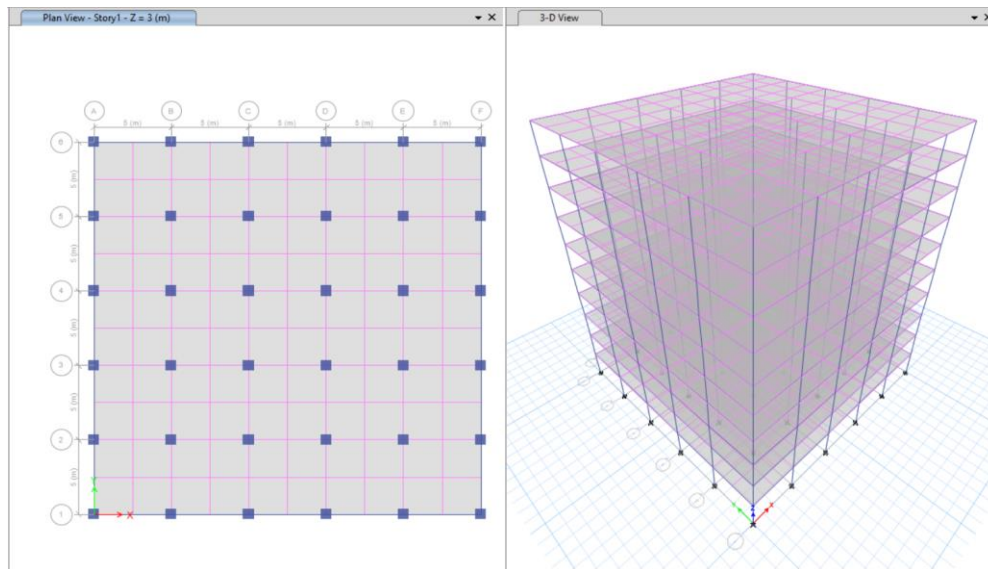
Plan and 3-D View of flat slab structure with perimeter beam
